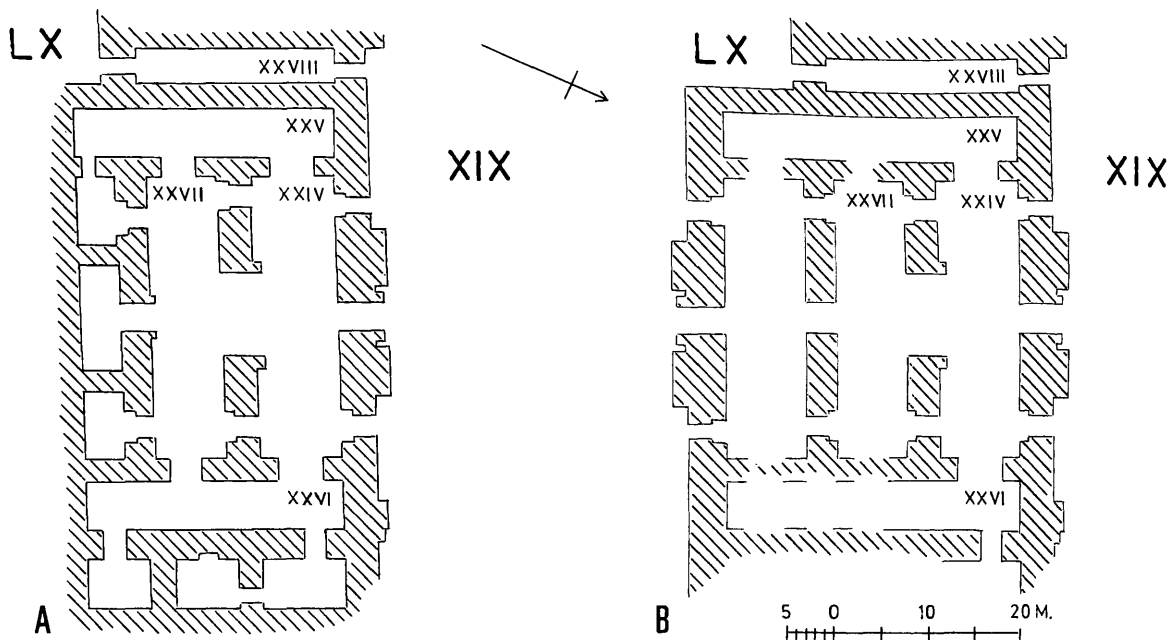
Rooms XXIV–XXVII – alternative restored plans.
